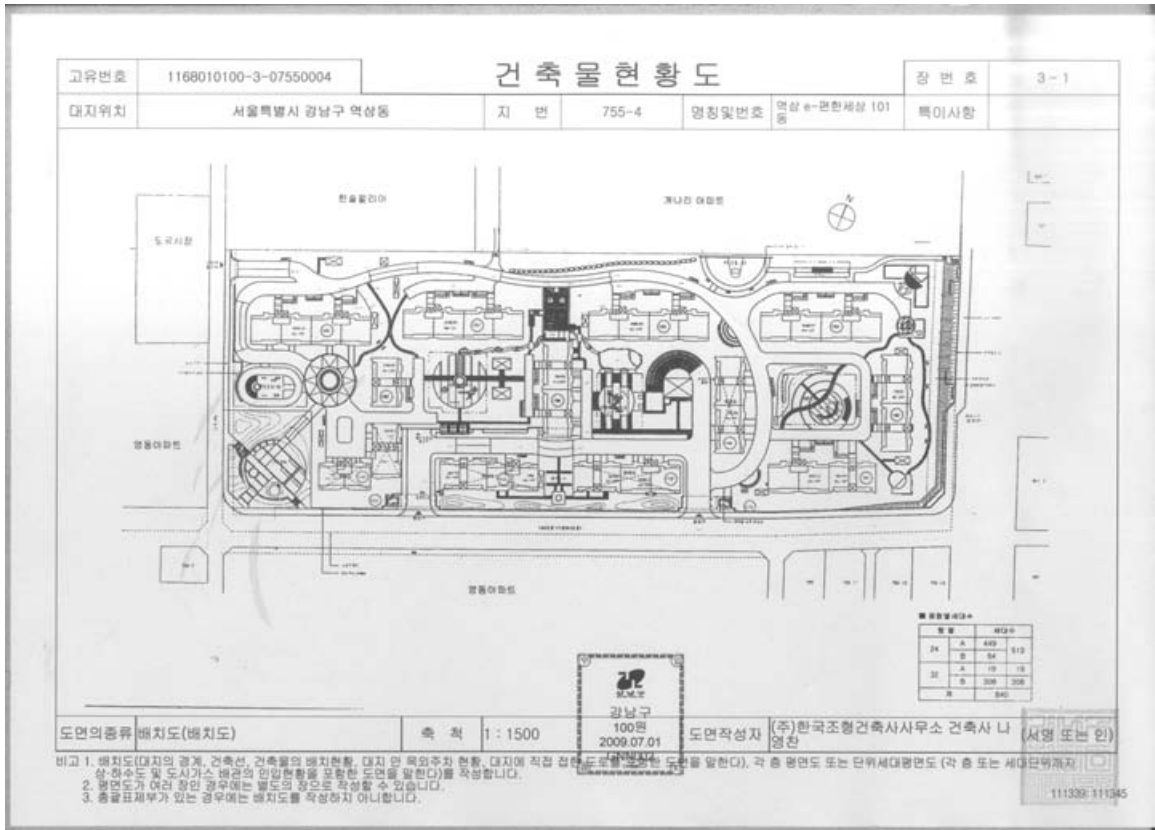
Site Plan of Yeoksam E apartment estate – 2 (Gangnam Gucheong)
